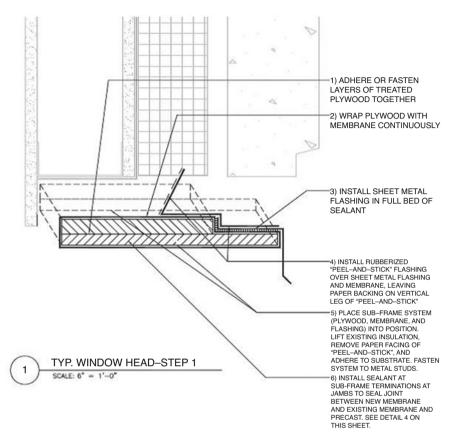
Step-by-step illustration of window head installation (Step 1)
